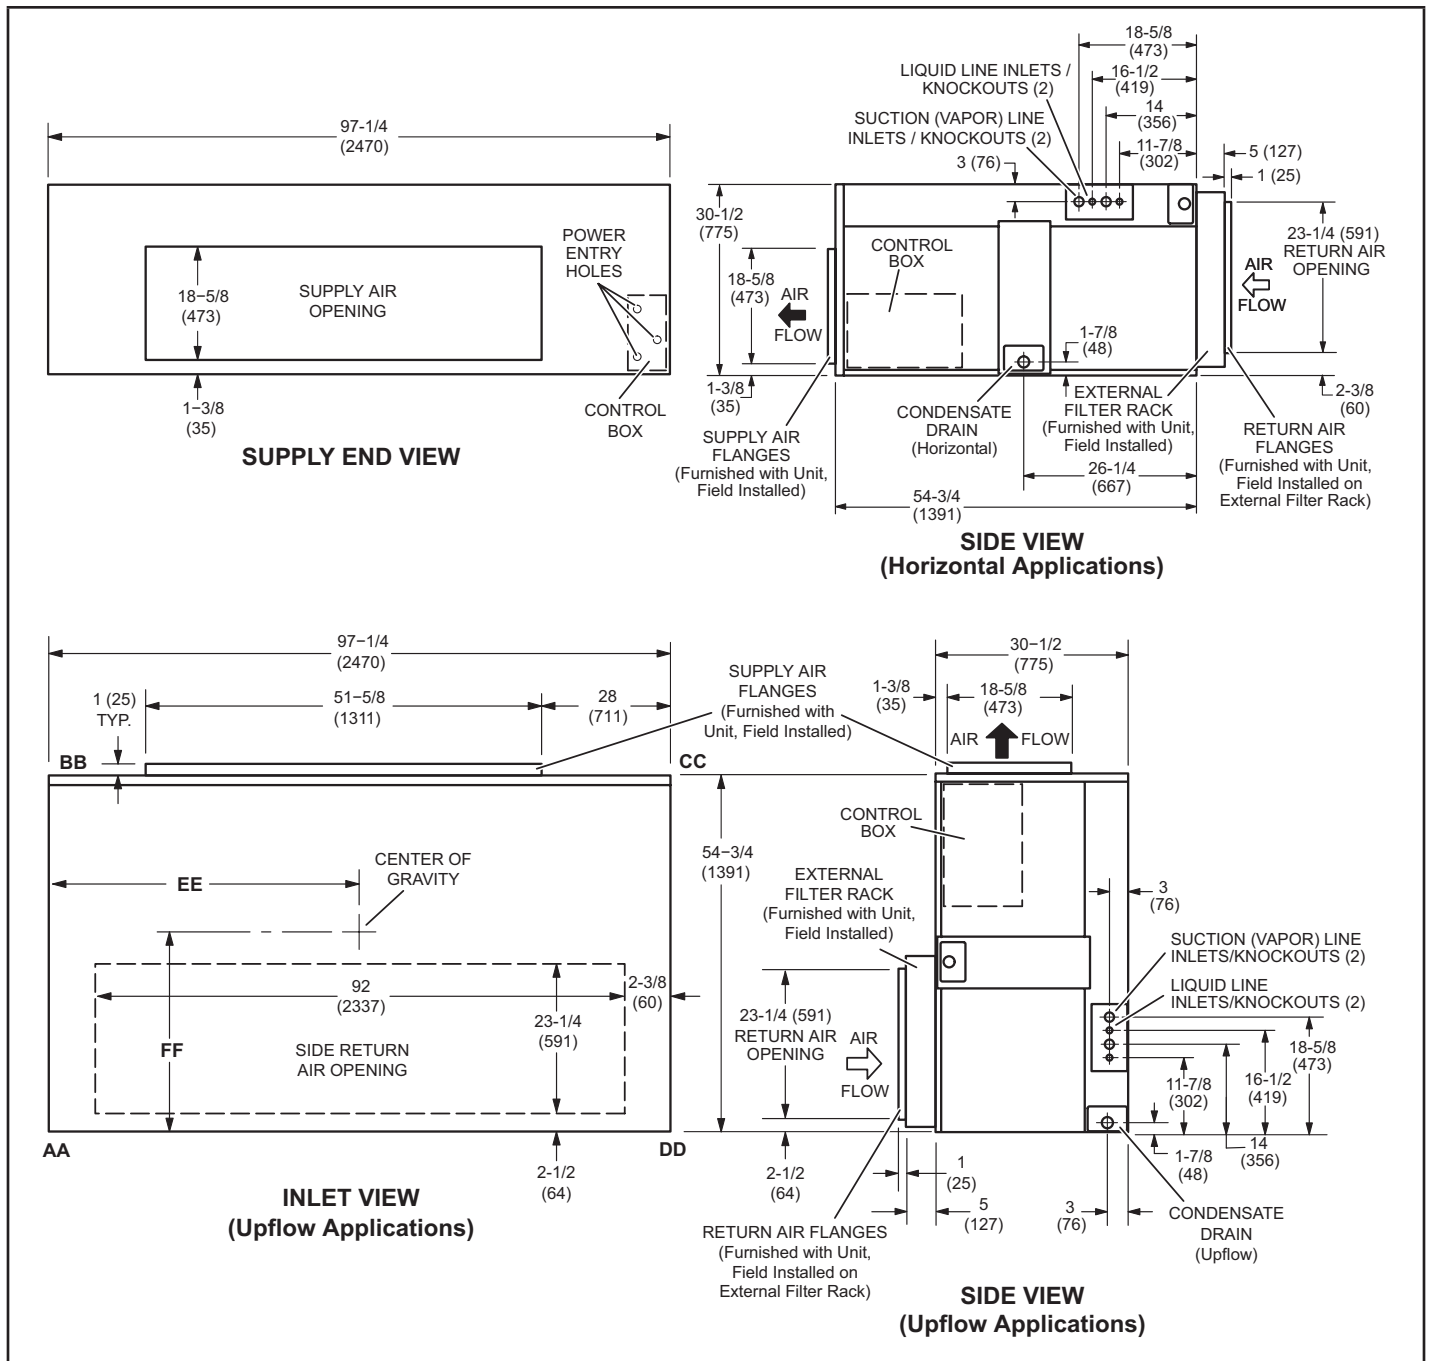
ELA 180-240 Unit Dimensions – inches (mm)
